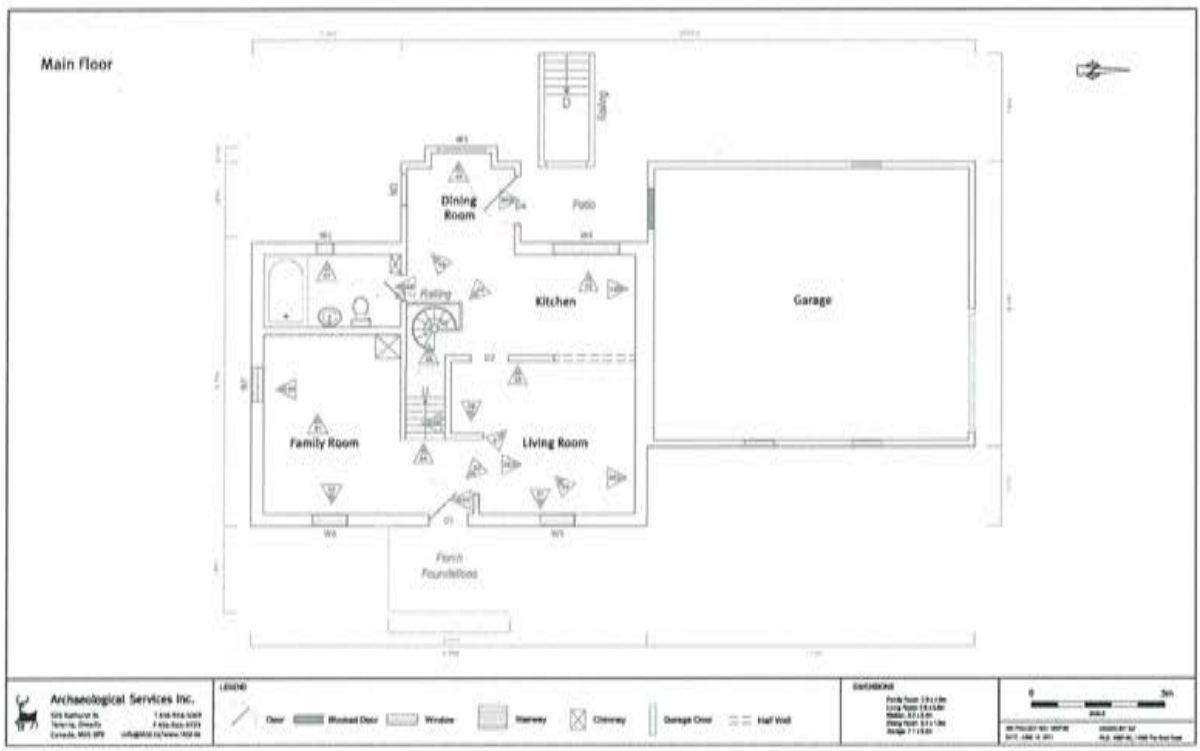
Interior floor plan of first floor showing overall dimensional measurements of residential exterior and internal rooms.
